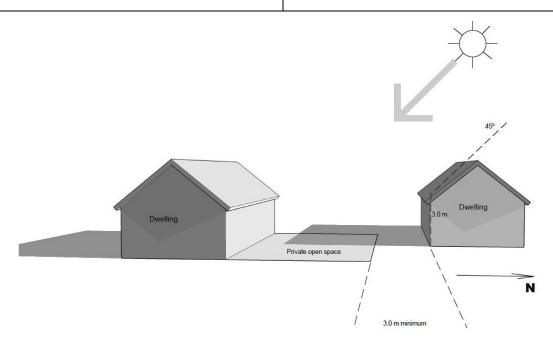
Separation from the private open space of another dwelling on the same site as required by clause 10.4.4 A1(a)
